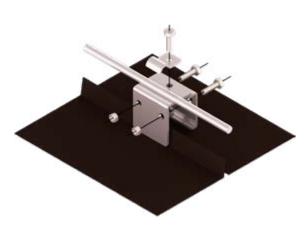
Installation of appropriate load-bearing elements on tin sheet roofing
